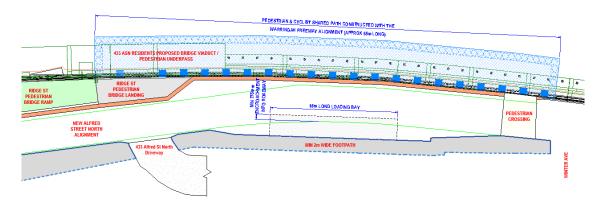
showing resident design proposal over available space for road layout. Blue area is outside of available space
